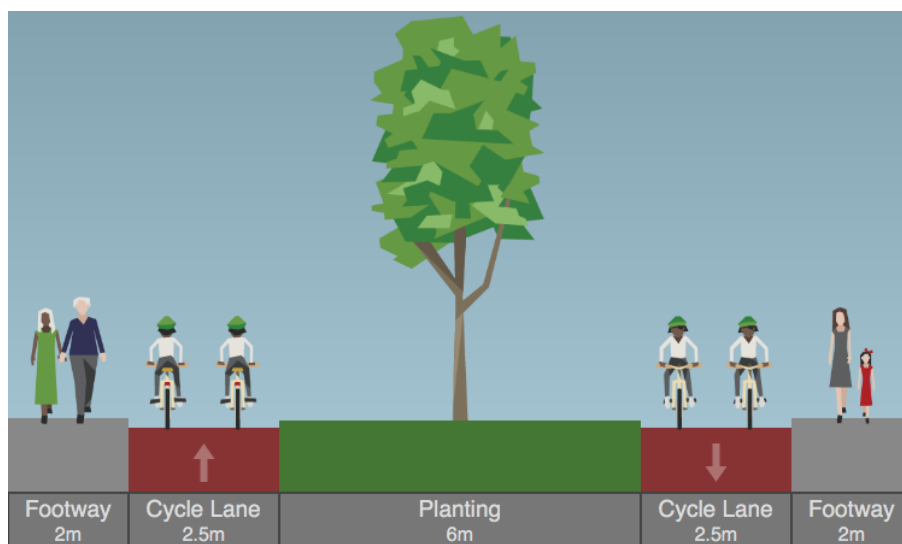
Space allocation at Ascham Road and Chesterton Hall Crescent
